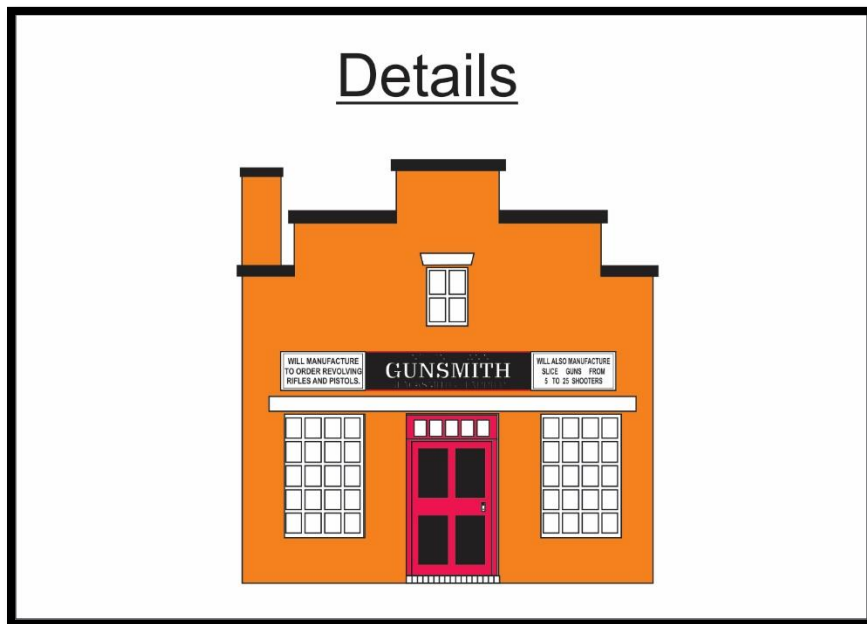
WINDOW, DOOR & DETAIL PLACEMENT
